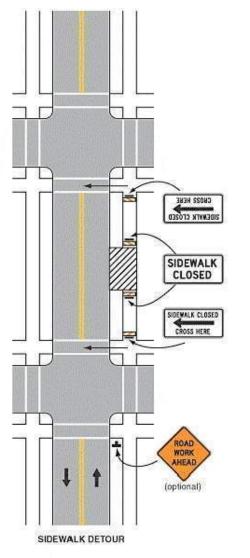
H-28. Sidewalk Detour or Diversion (TA-28)
